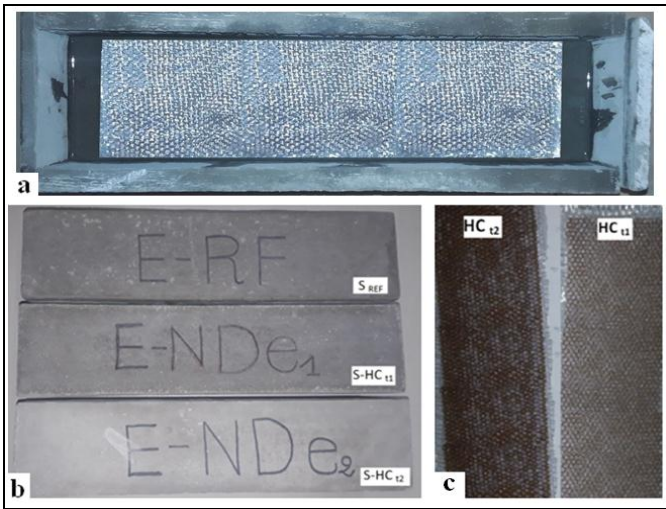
a- Honeycomb sandwich panel structure in the concrete beam, b- Rectangular concrete beams, c- Honeycomb sandwich panel structures.
